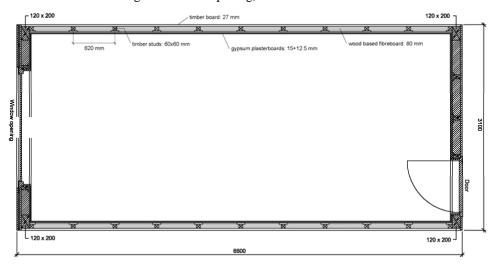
Schematic plan of the hotel module G2 made of light timber frame assemblies.
